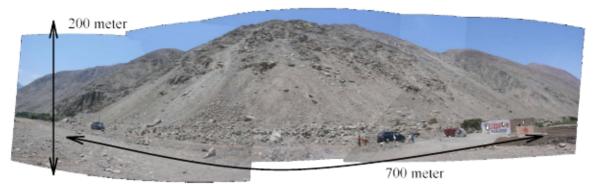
Rock Fall. Canete-Yauyos Road, 60km from epicenter.
